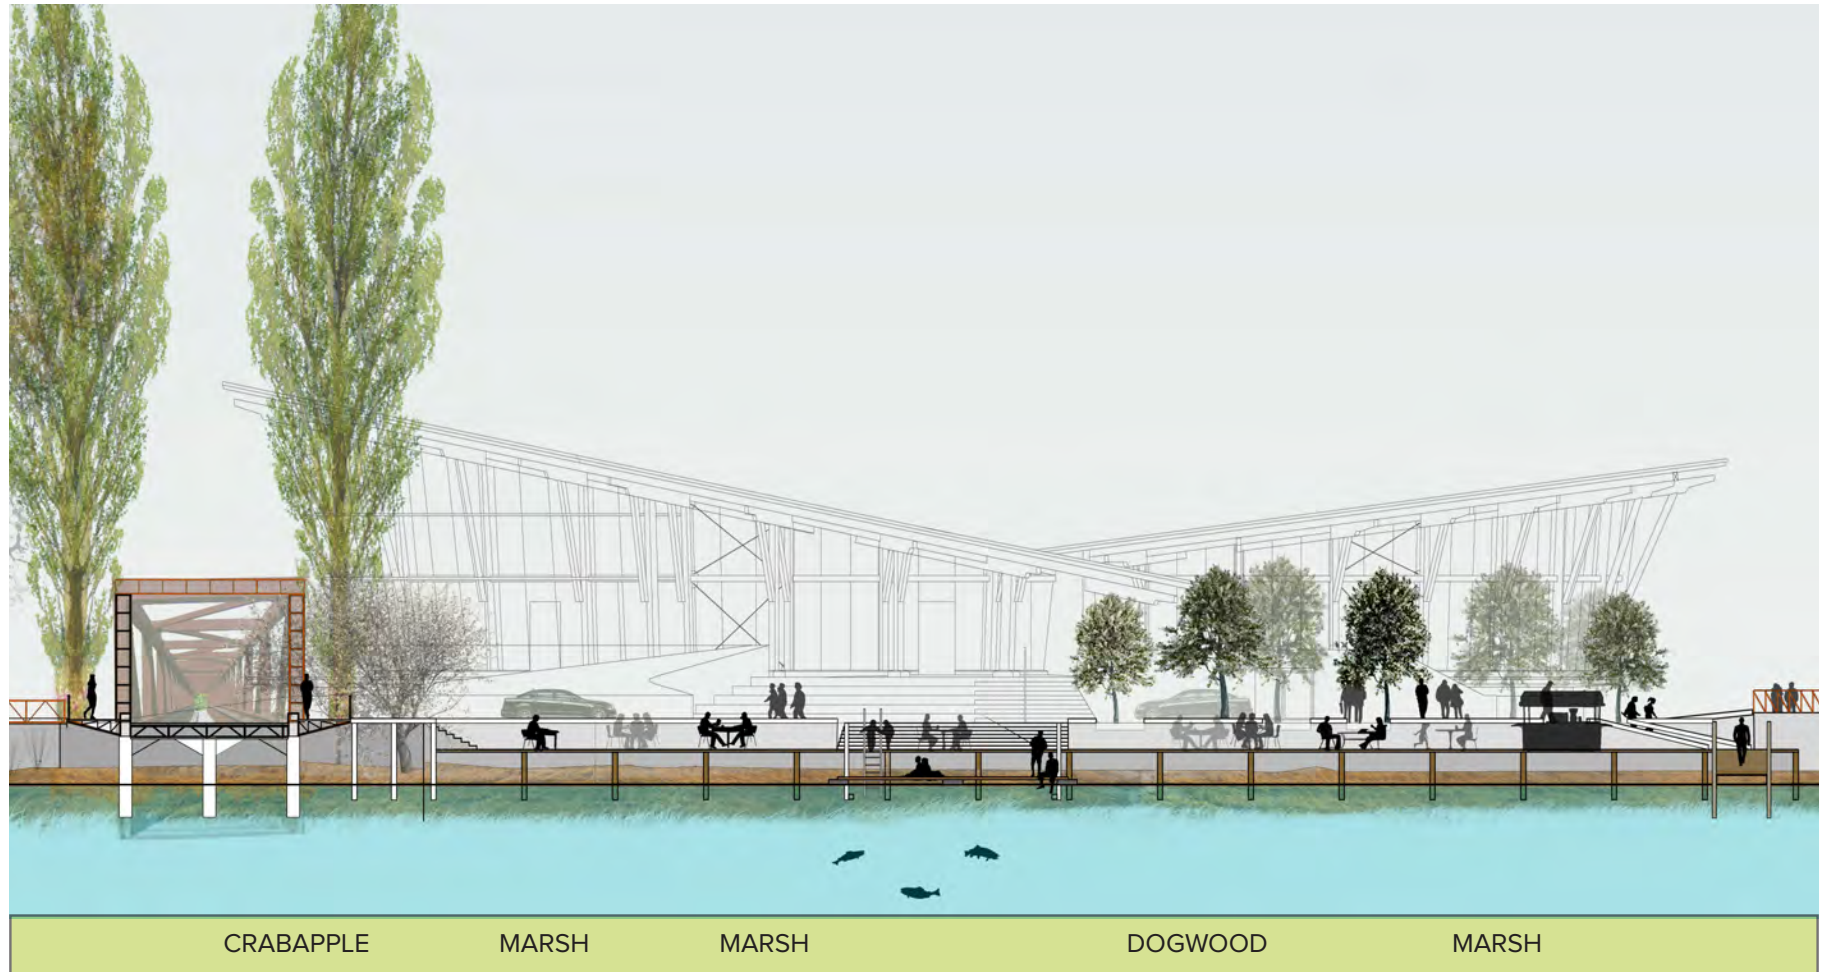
Elevation A-A': Logger's Bridge and the Plaza
